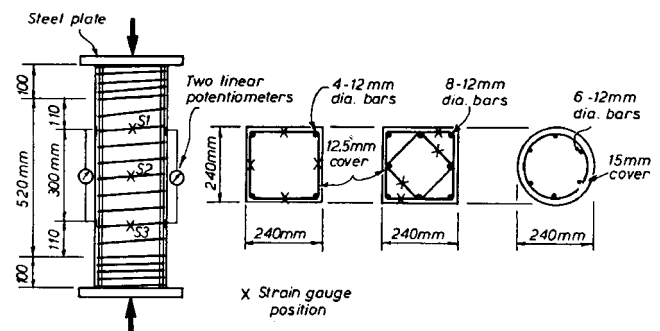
Short column with axial compressive loading: principal dimensions; test setup; instrumentation; and position of strain gages.
